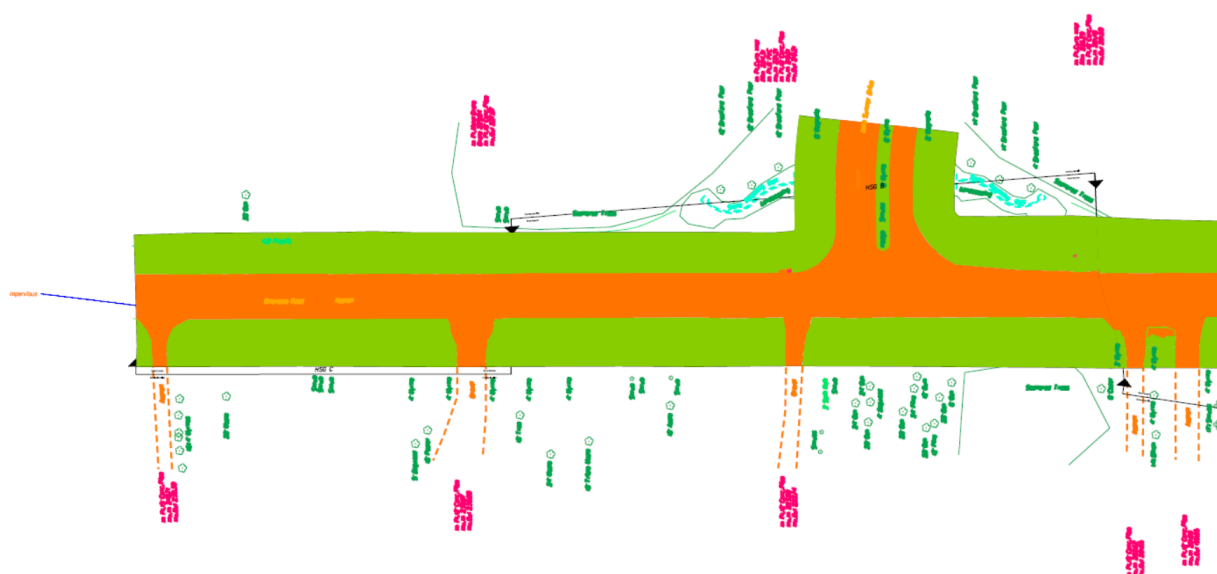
Plan View of Proposed Design Land Types Close Left Side View
